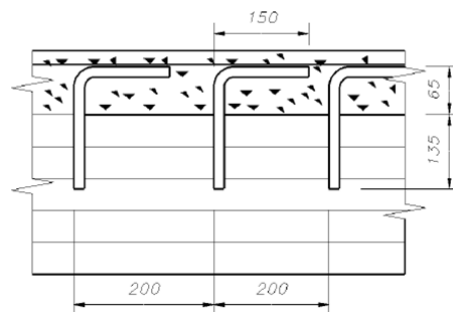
bent dowels epoxy glued into the timber, Piazza and Ballerini 2000 (dimensions in mm)
